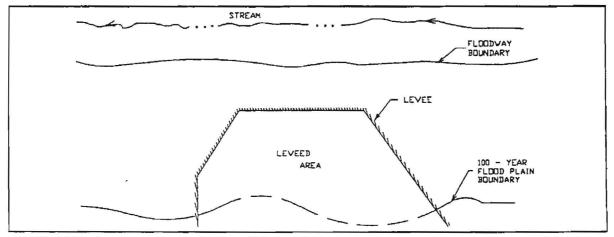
Typical Layout of Levee Tied into High Ground
